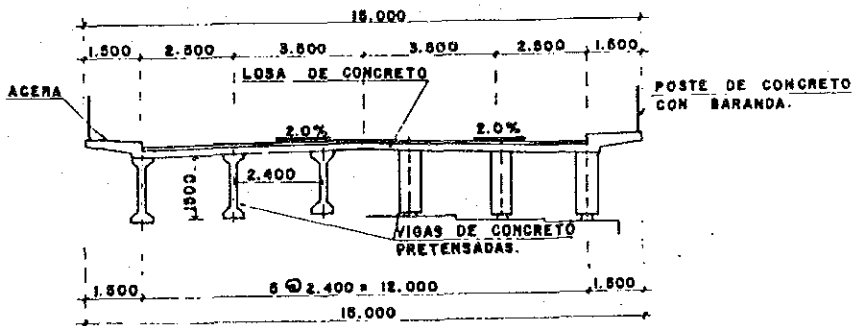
Typical Superstructure Section of El Arroyo No.1 Bridge, PC Girder
